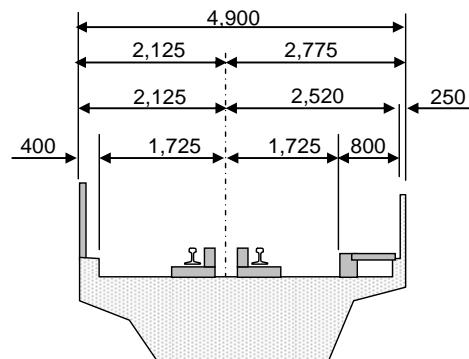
Section Size of Single Track Line (unit: mm)
